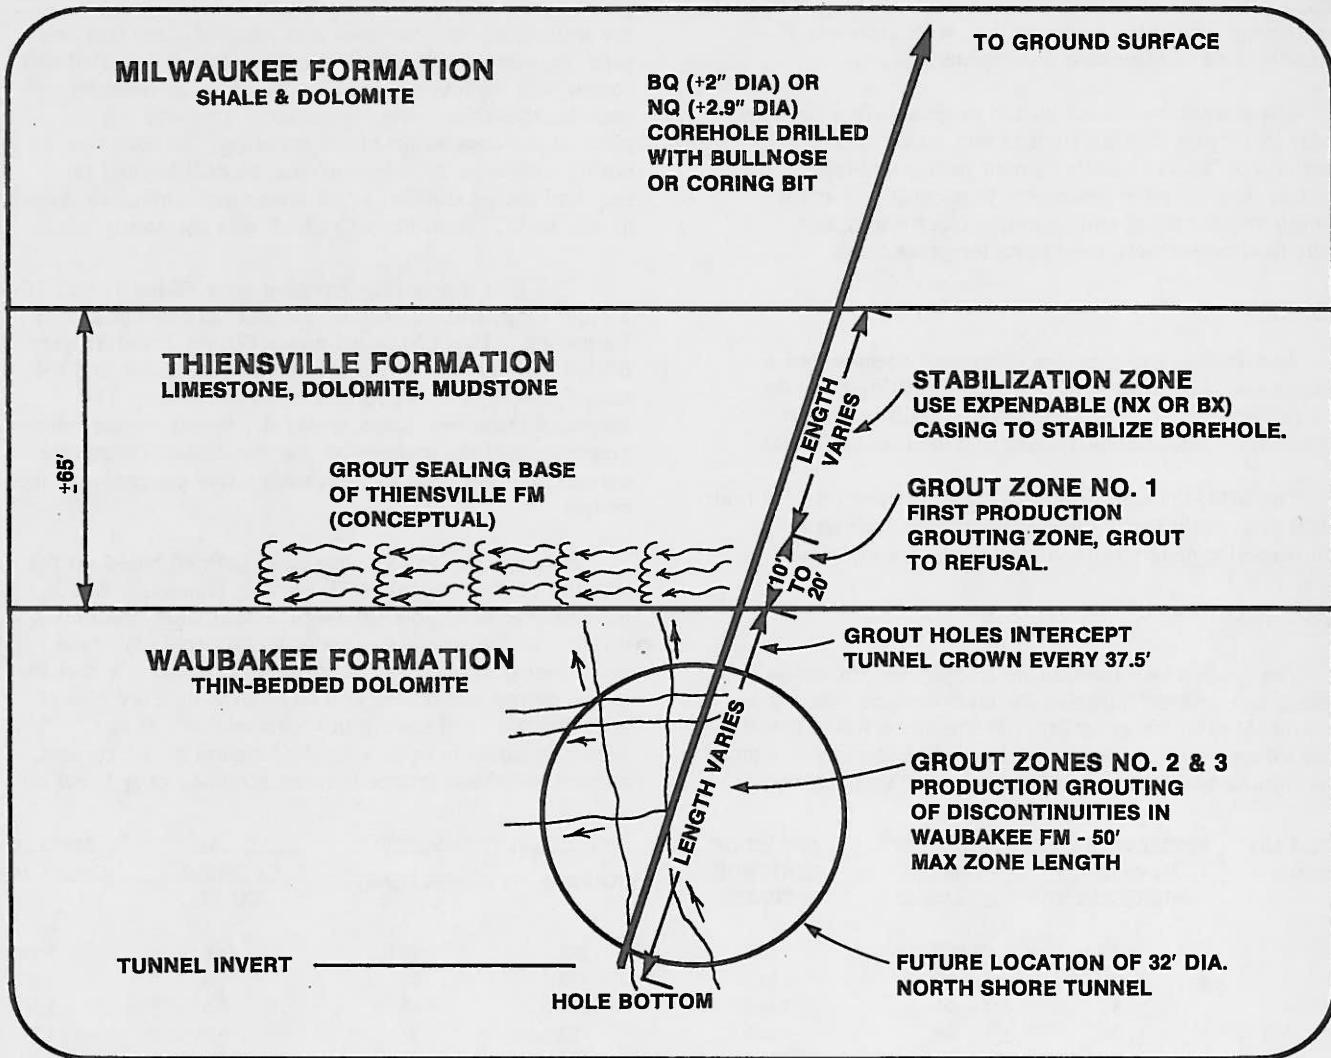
CONCEPTUAL ILLUSTRATION OF GROUTING ZONES
